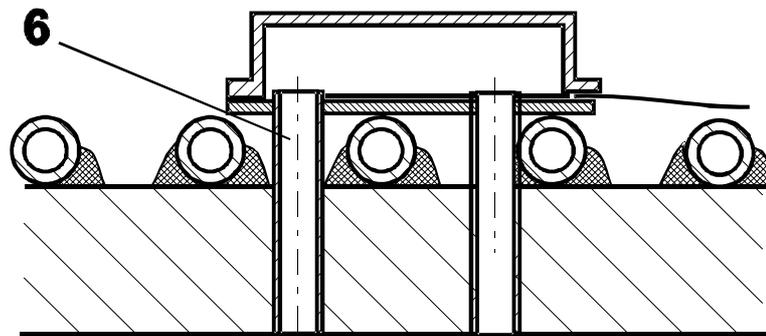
Arrangement of the dew point sensor in a closed ceiling cavity
